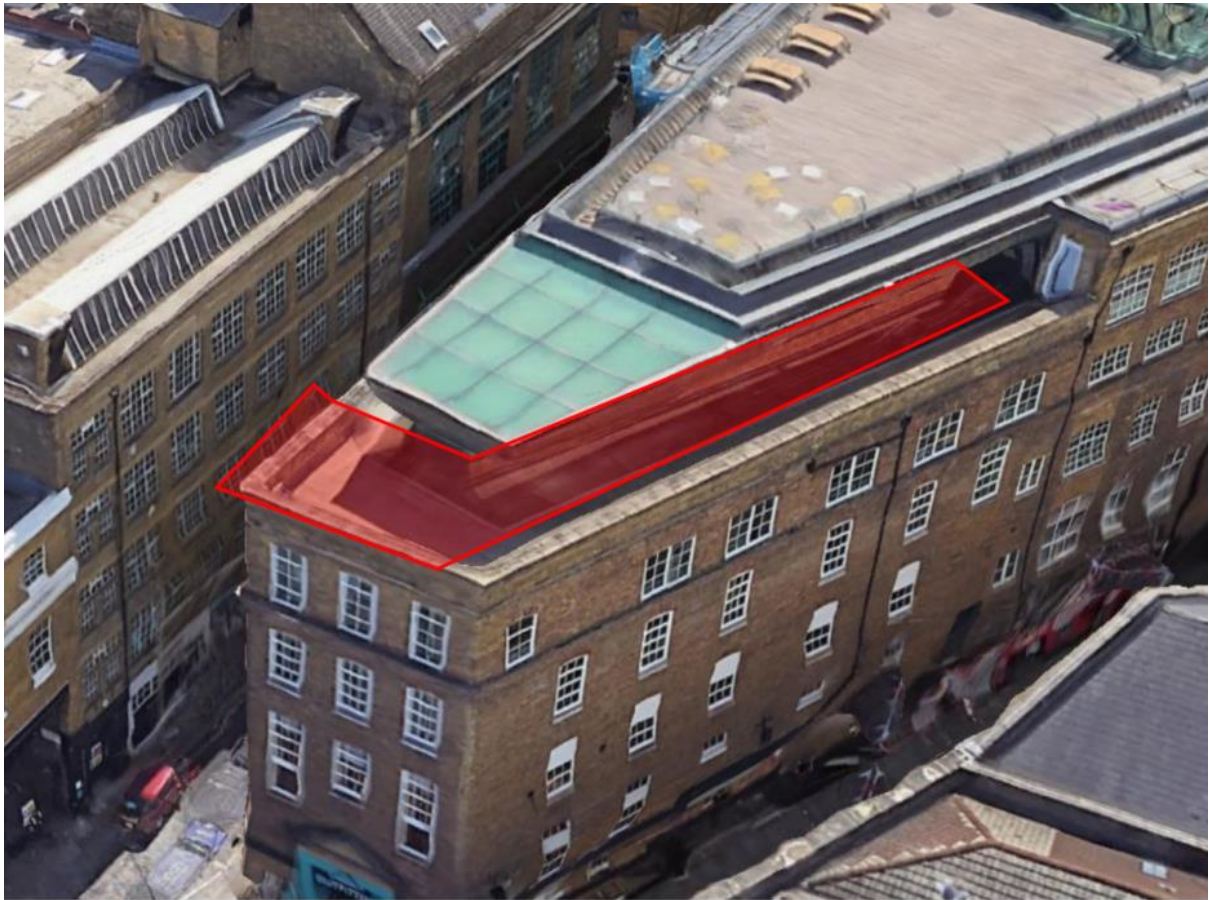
(above): Aerial view showing extent of terrace area at 5<sup>th</sup> floor level which is highlighted in red
